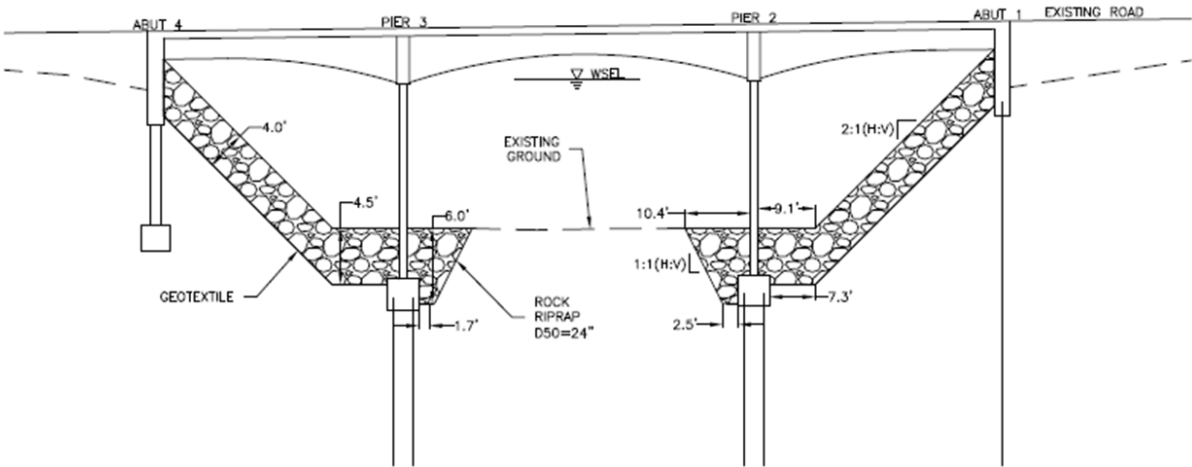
Cross-sectional view of Bridge B-16-FT with recommended hydraulic scour countermeasures
